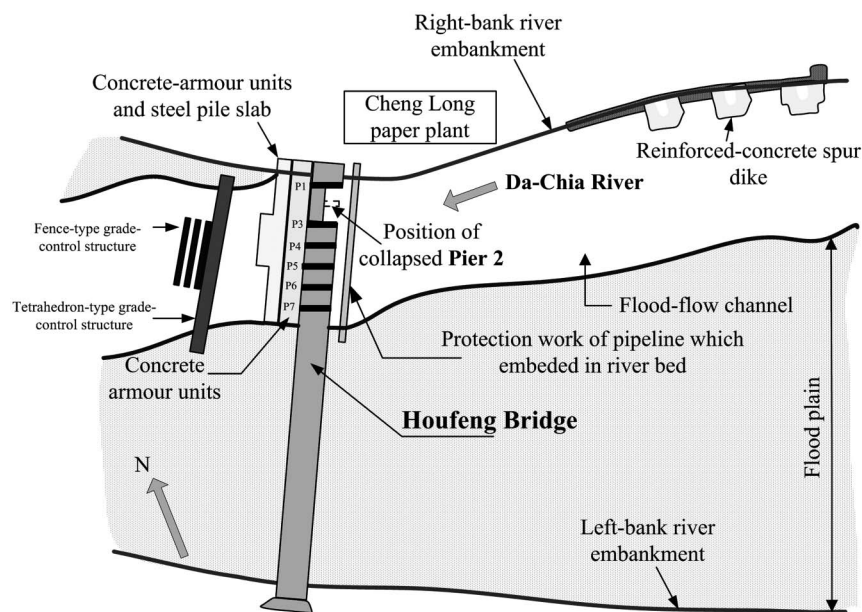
Schematic site plan of the Houfeng Bridge near-field at failure
